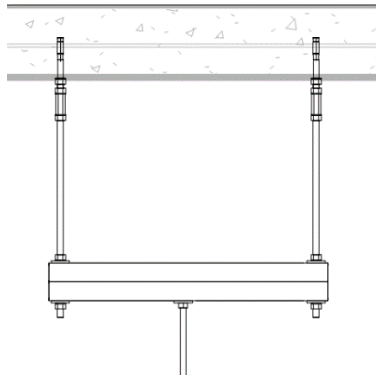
A Trapeze Created to Avoid an Above Ceiling Conflict
